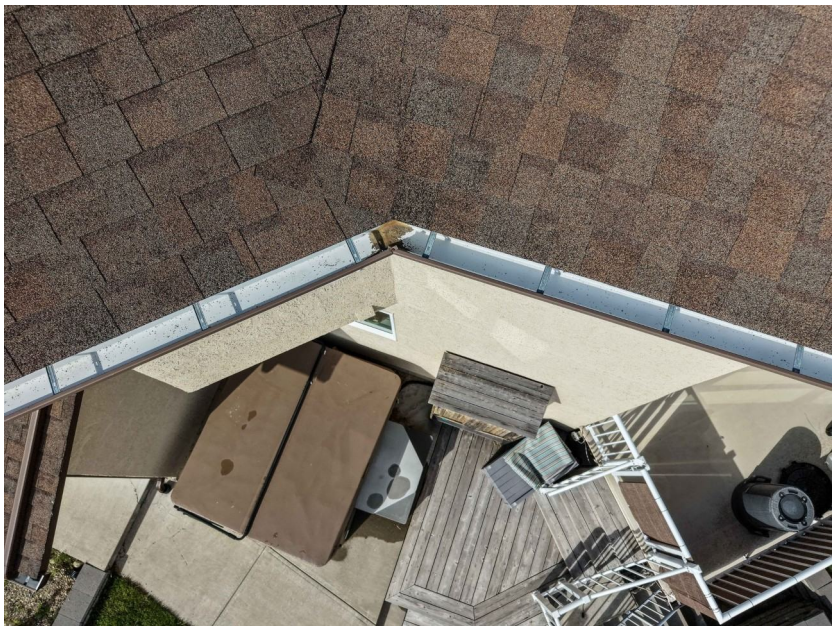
Overview — Drainage / Gutters and Downspouts, South.
